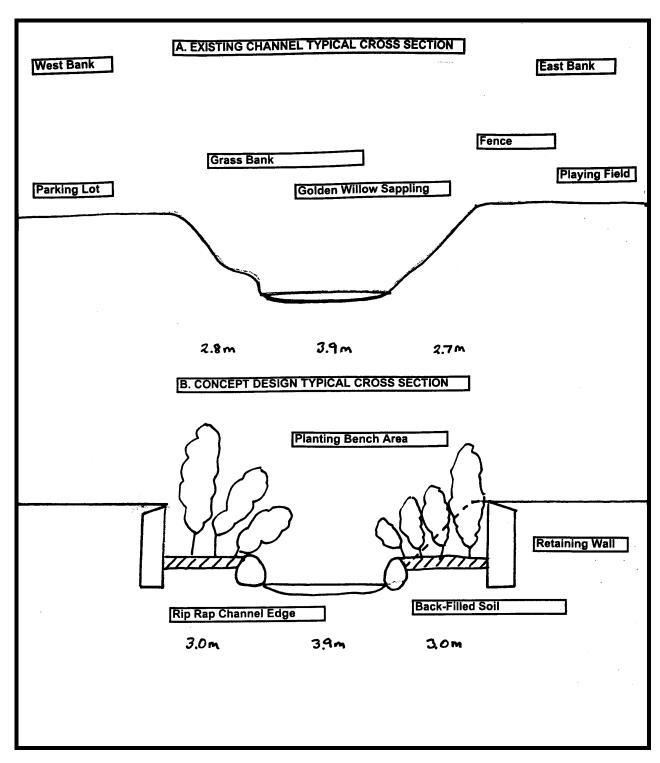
Typical cross section of Bowker Creek in Zone 1 showing concept design for proposed bank reconstruction and riparian restoration work.
